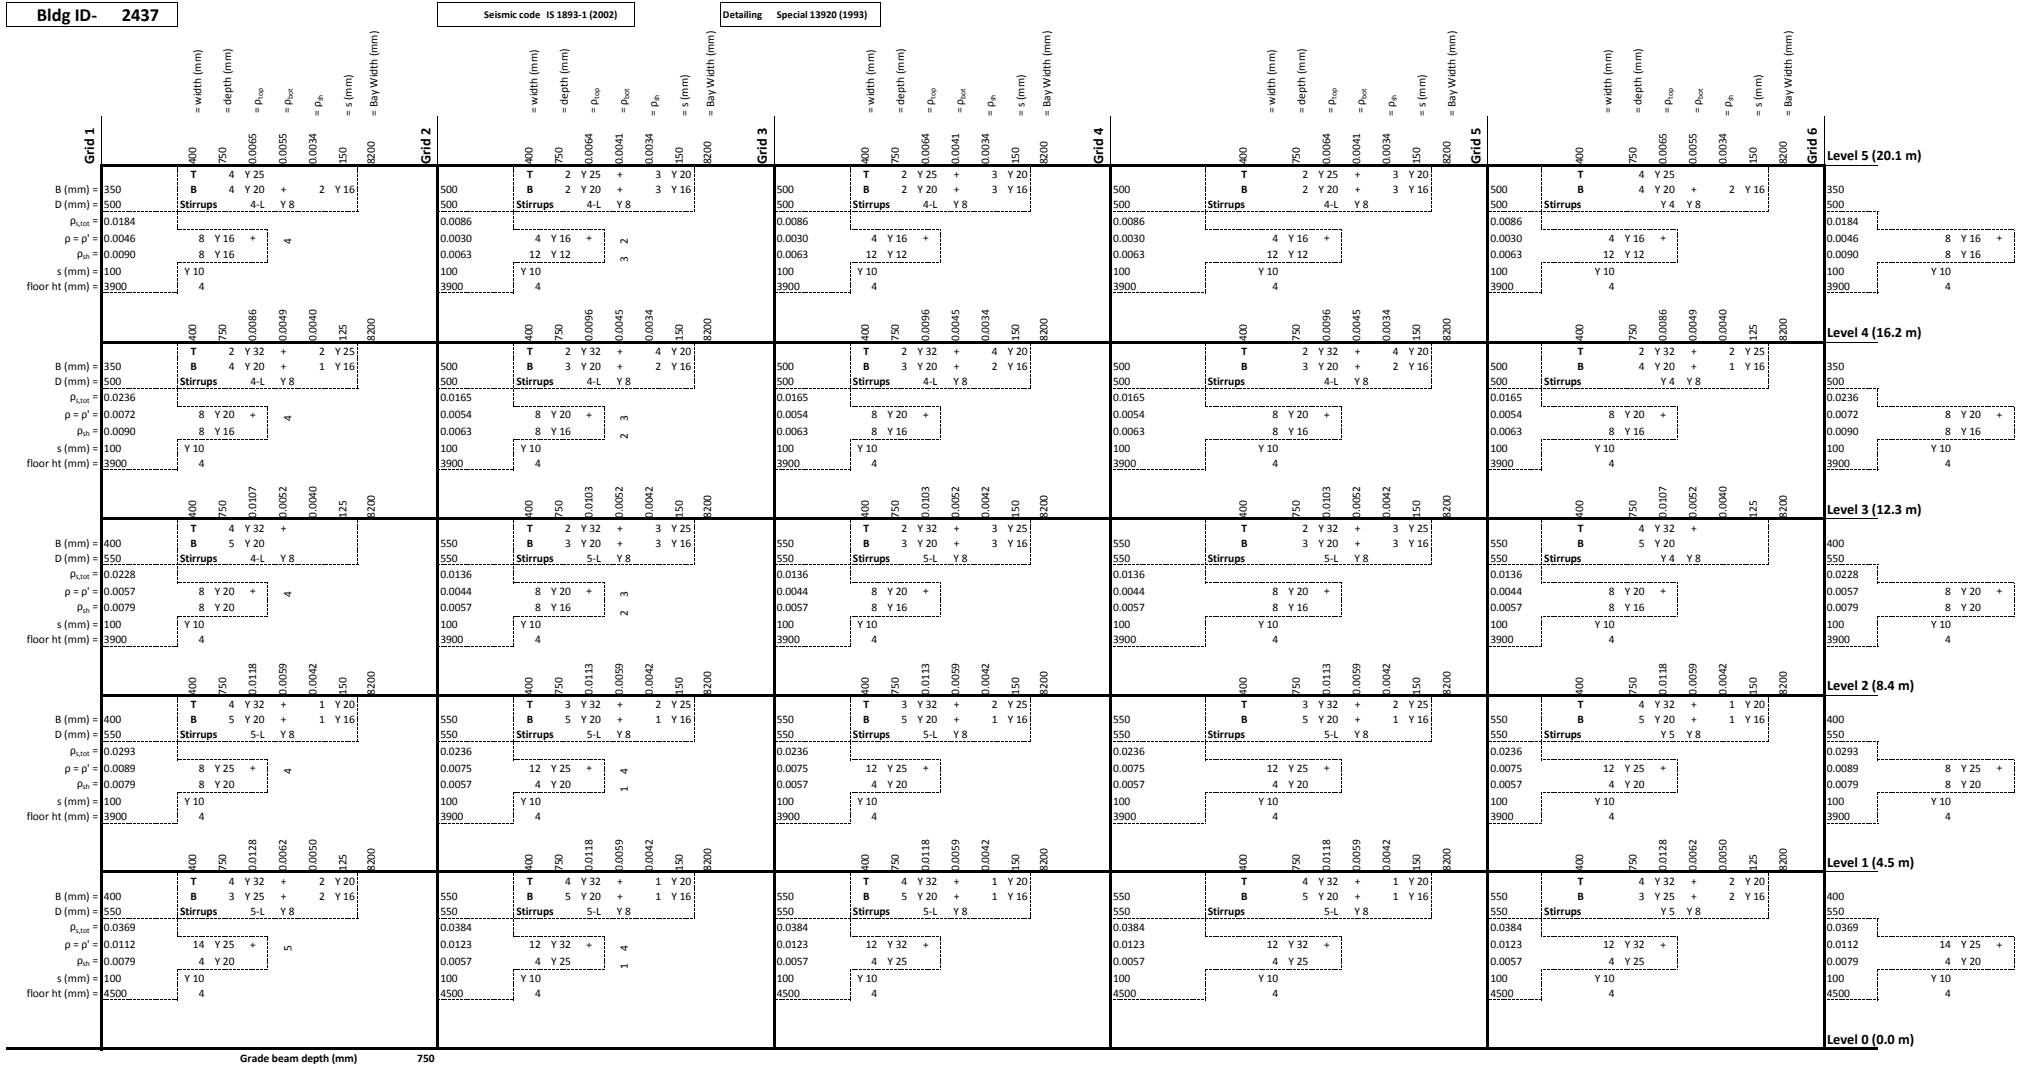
Provided reinforcement and modeling details for building ID 2437
